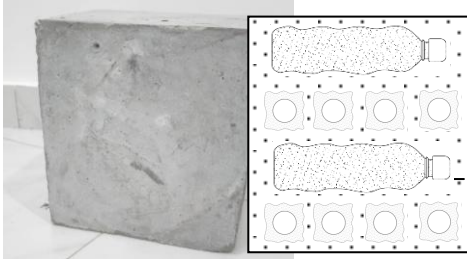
PET Brick masonry block a) Line sketch showing PET brick arrangements b) PET brick Masonry block
